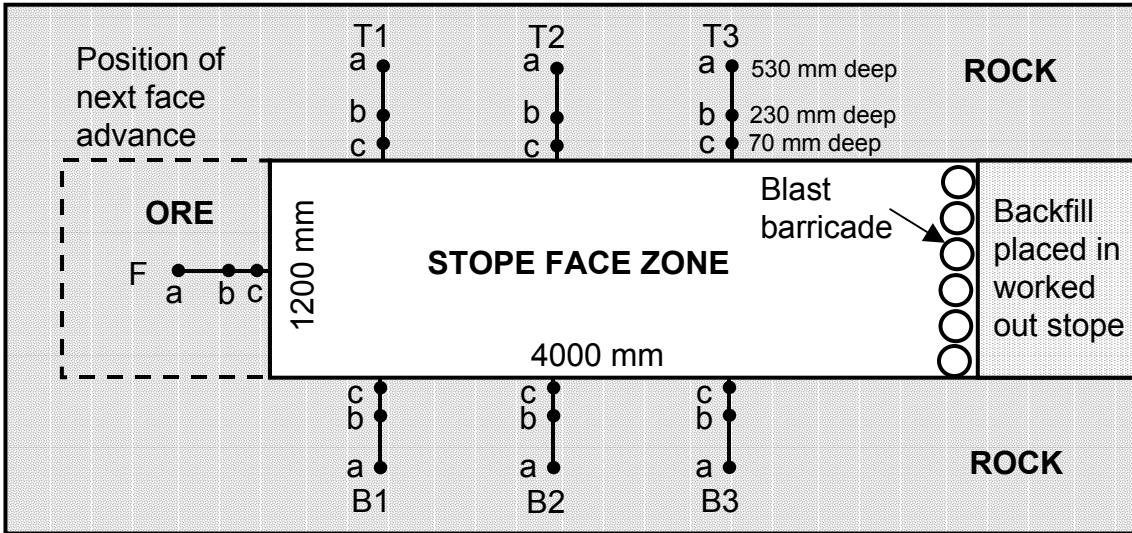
Typical section through stope used for underground field trials<sup>9</sup>
